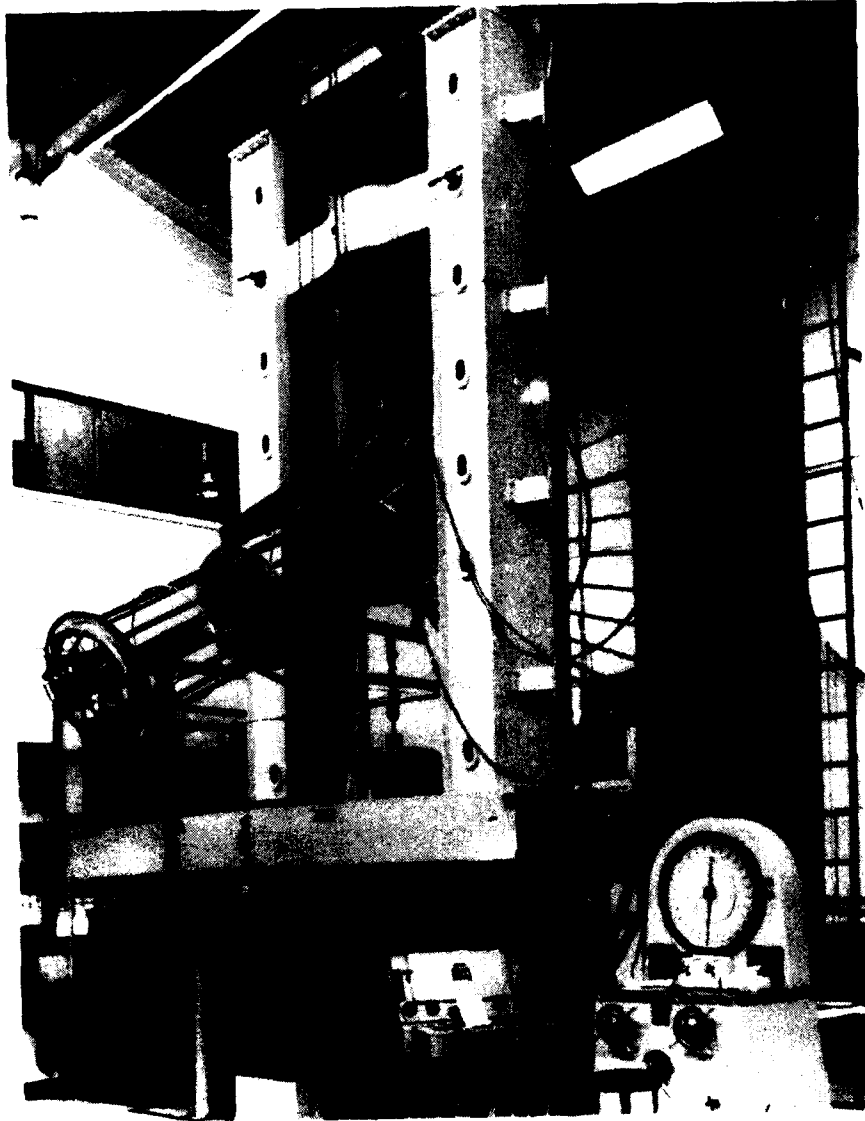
DHWRS AND LOADING SYSTEM INSTALLED IN
